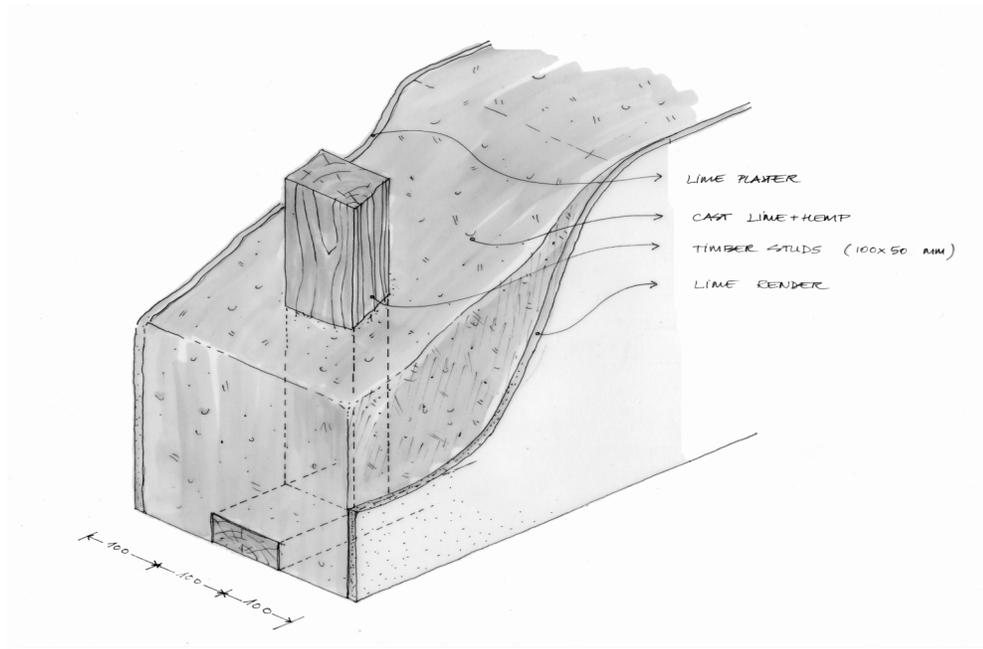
Hempcrete Wall. Source: Ian Pritchett (CAT 2006).
